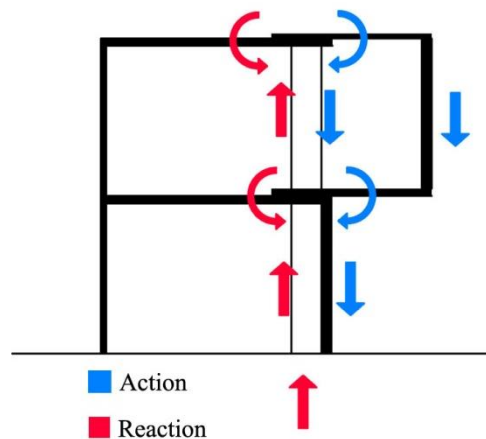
Forces diagram in a building façade and a multi-angled façade unit connected to it according to scenario 2
